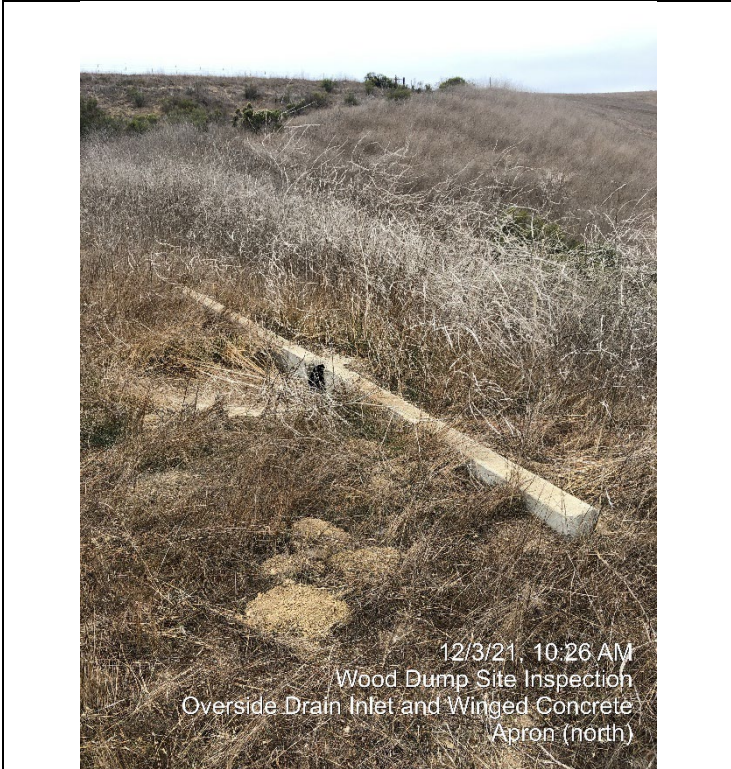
Oversight drain inlet and winged concrete apron (north side of Site), facing northeast.
